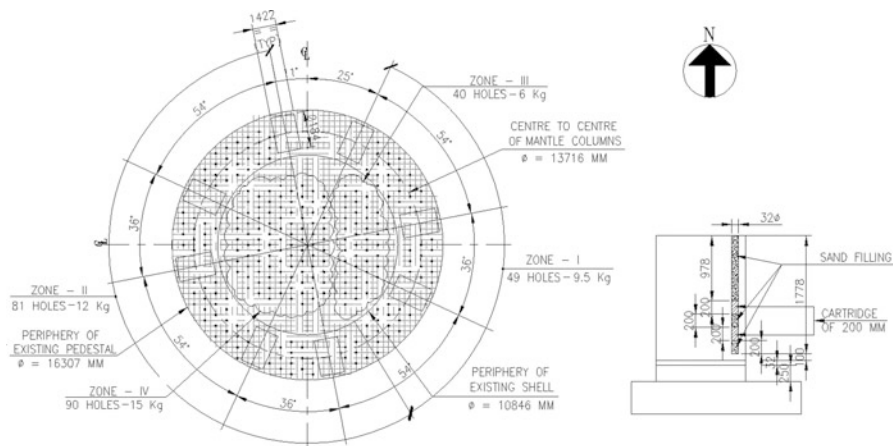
Disposition of blasting holes, sequence of blasting and details of charge placement
